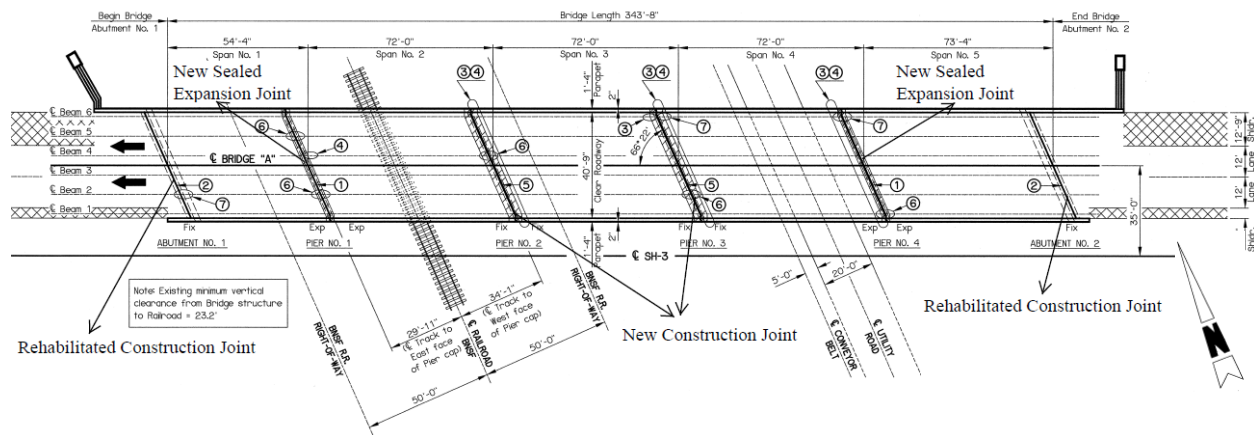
Repair details for SH-3 north bridge over BNSF railroad
